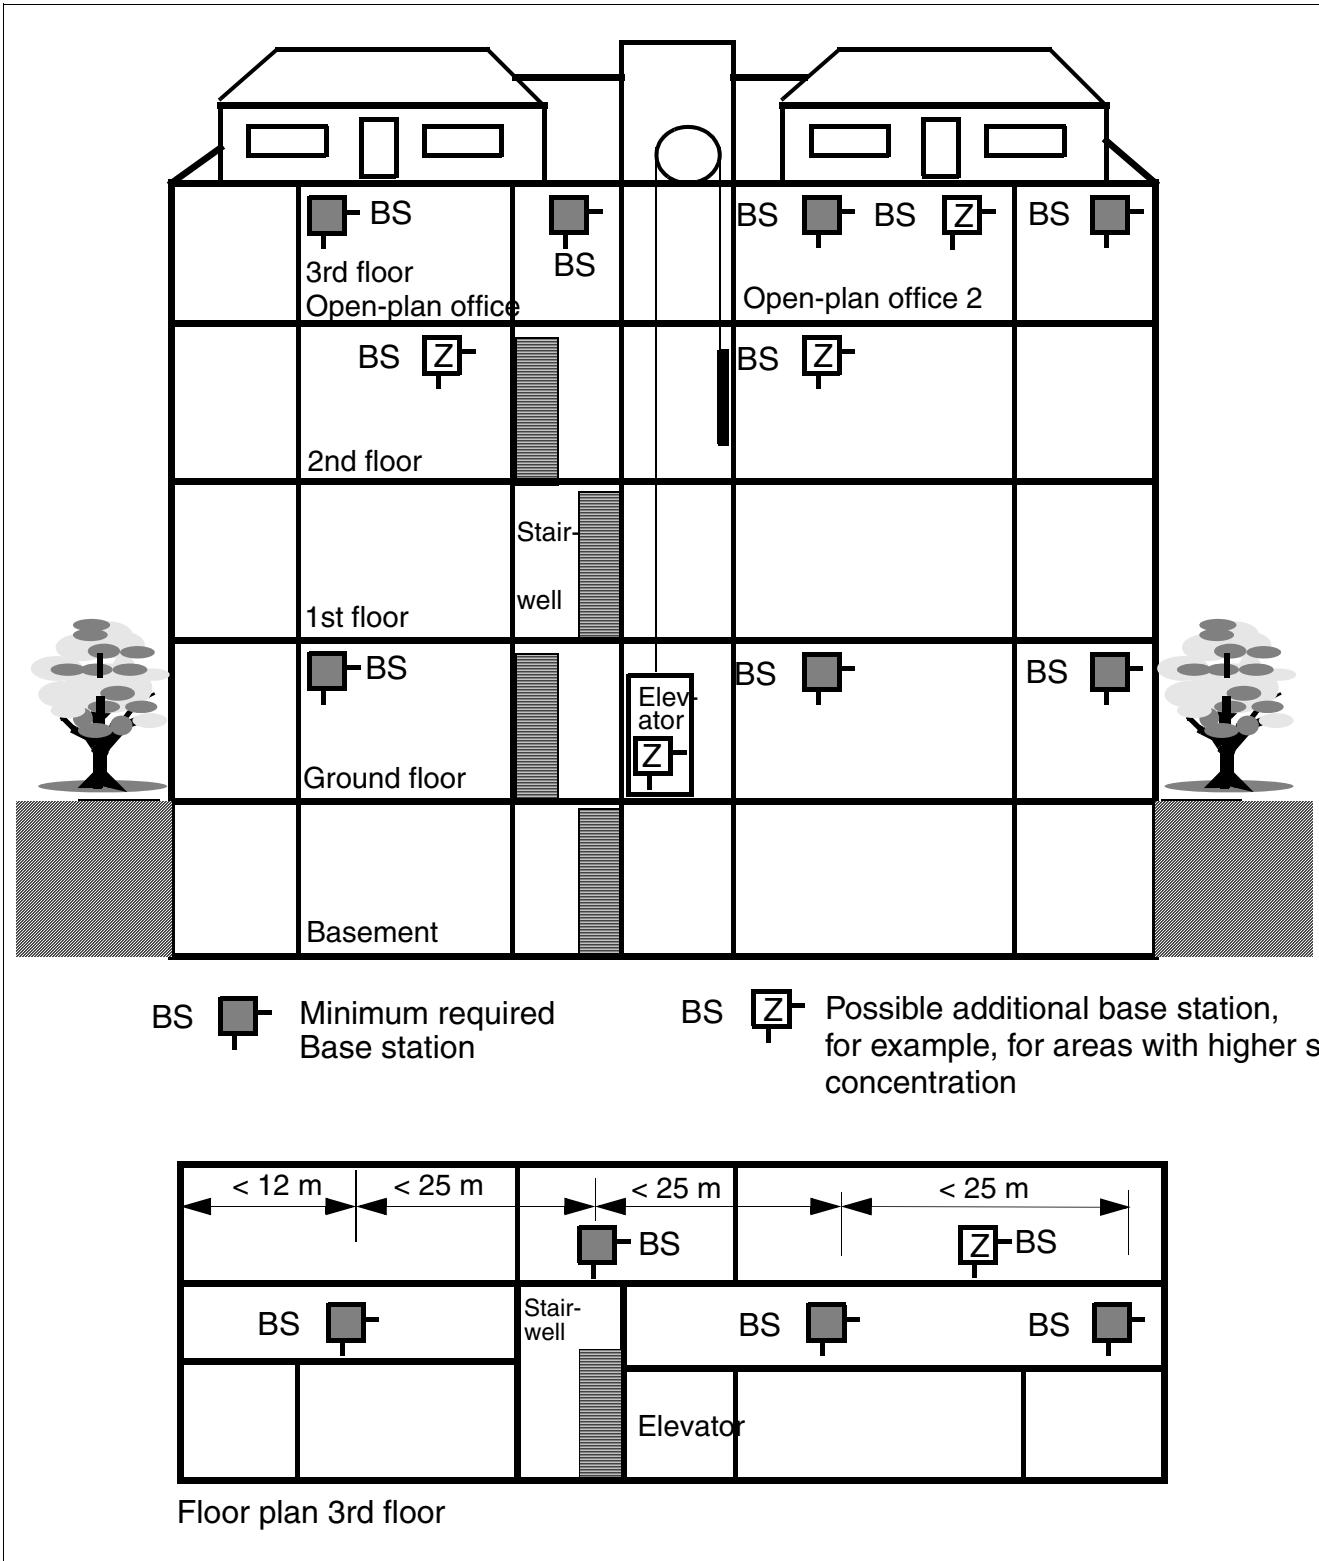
Base station distribution in interiors with concrete and steel dividing walls
